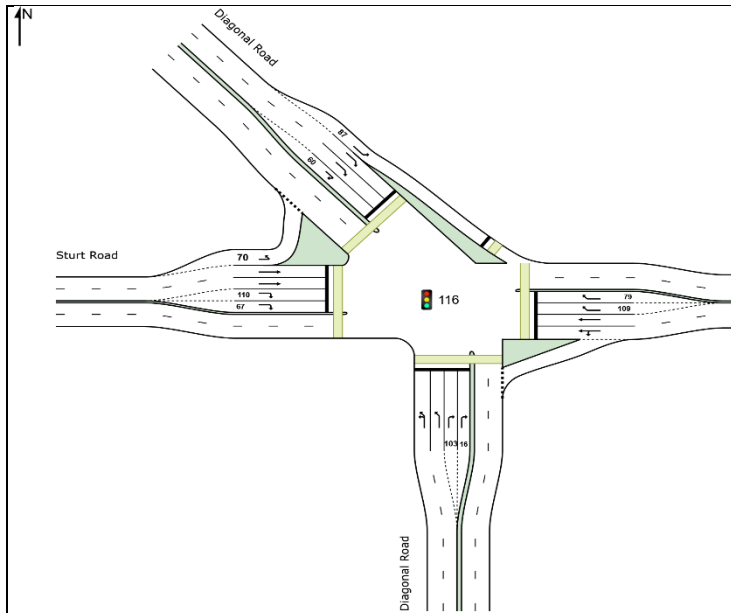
TS116 Diagonal Road – Sturt Road Site Layout
